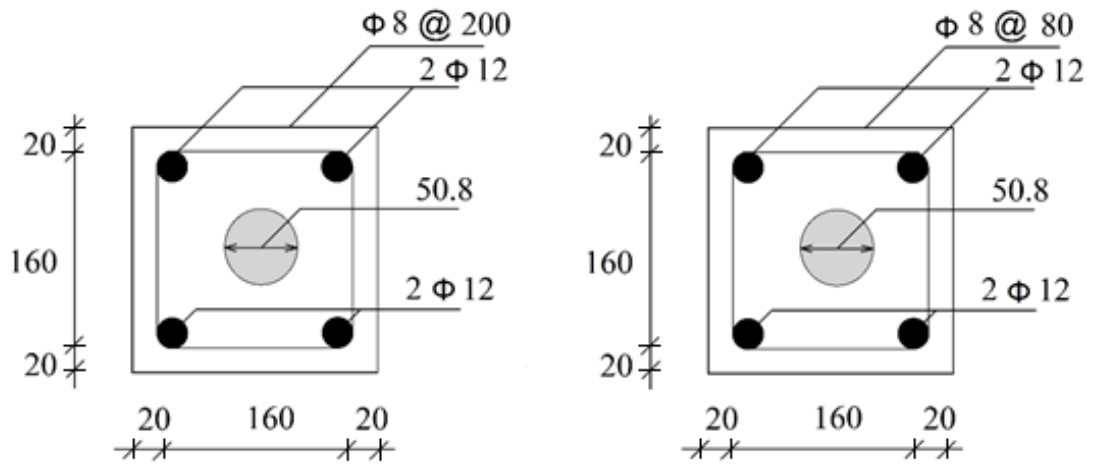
Cross section of poorly confined columns and highly confined columns
